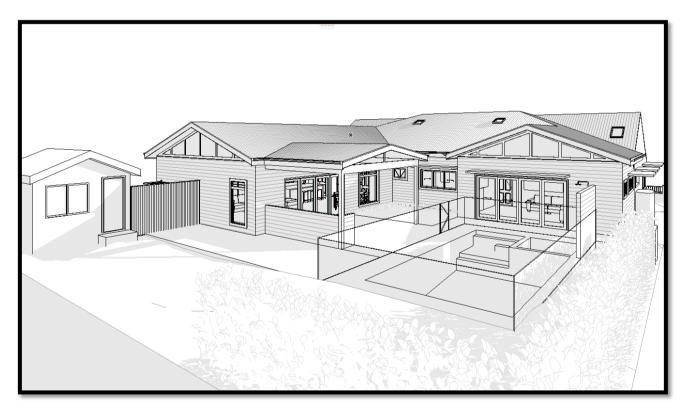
Proposed works at No. 27 Grace Avenue. (Action Plans 2020).
